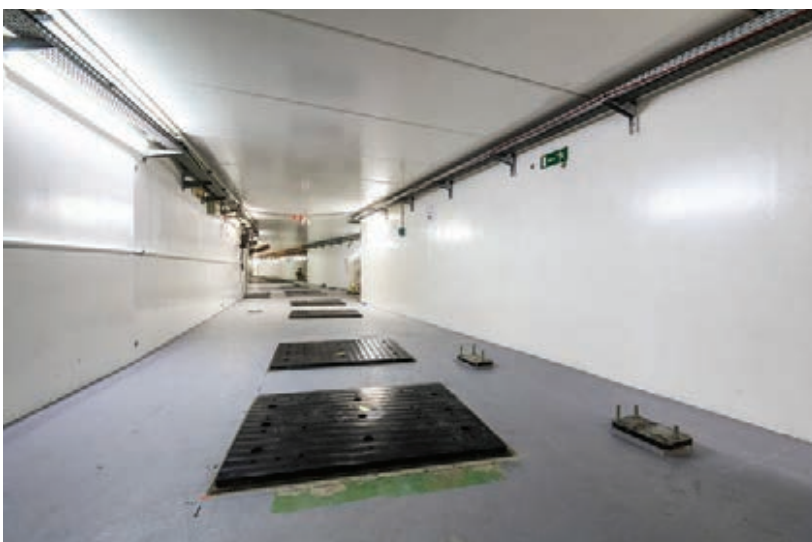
Civil works were carried out to prepare the tunnel for the new lattice, including painting and installing new girder support plates.
